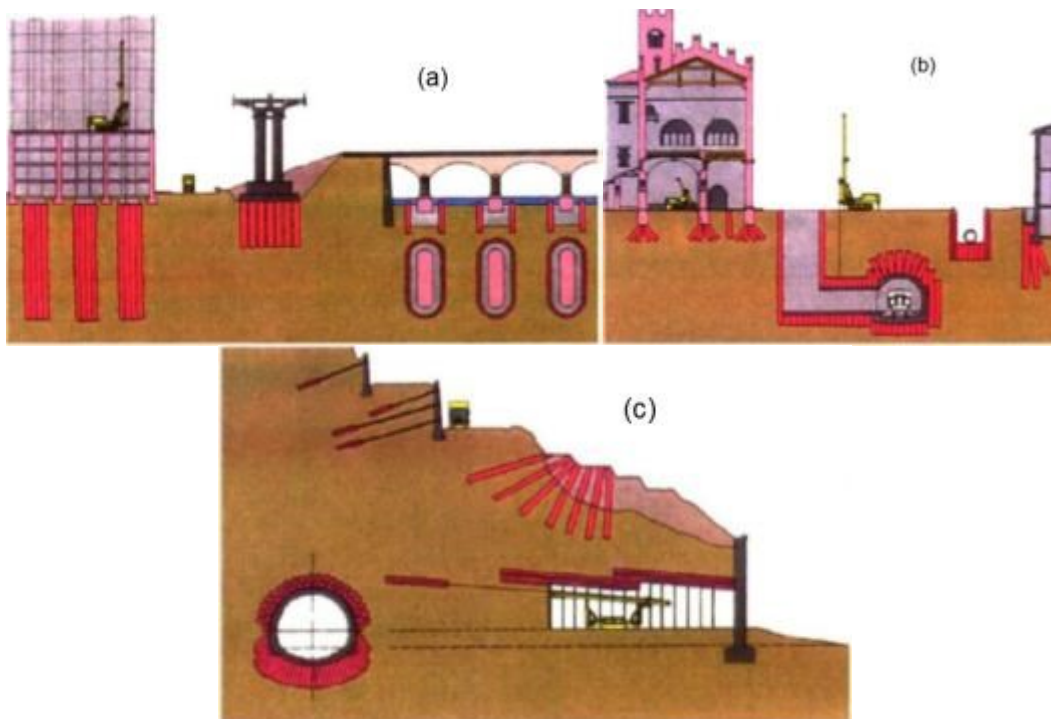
Jet grouting applications: (a) foundations and cofferdams; (b) underpinning, excavations, shafts, soft ground tunneling; (c) anchorages, slope stabilization, NATM tunneling (“Trevi Brochure” 2010)
